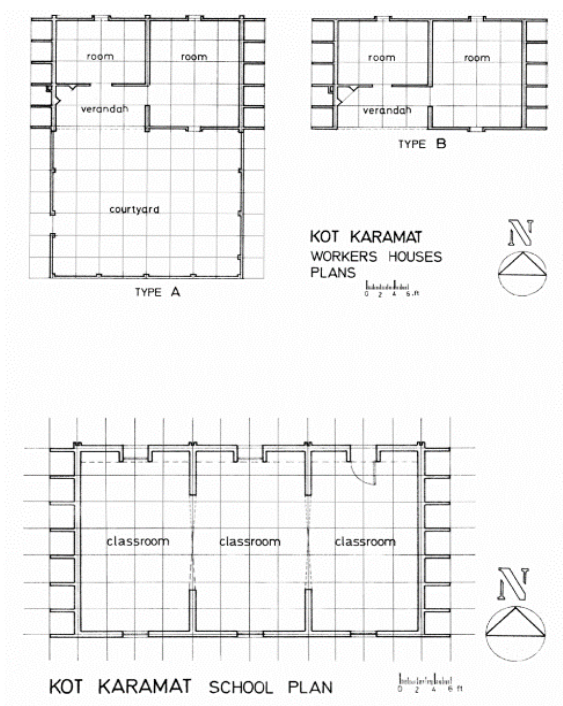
Workers House Plan, Section and Elevation at Kot Karamat Village, (source: architexturez.net Kot Karamat Village | A South Asia, <https://architexturez.net/doc/az-cf-166701>)
